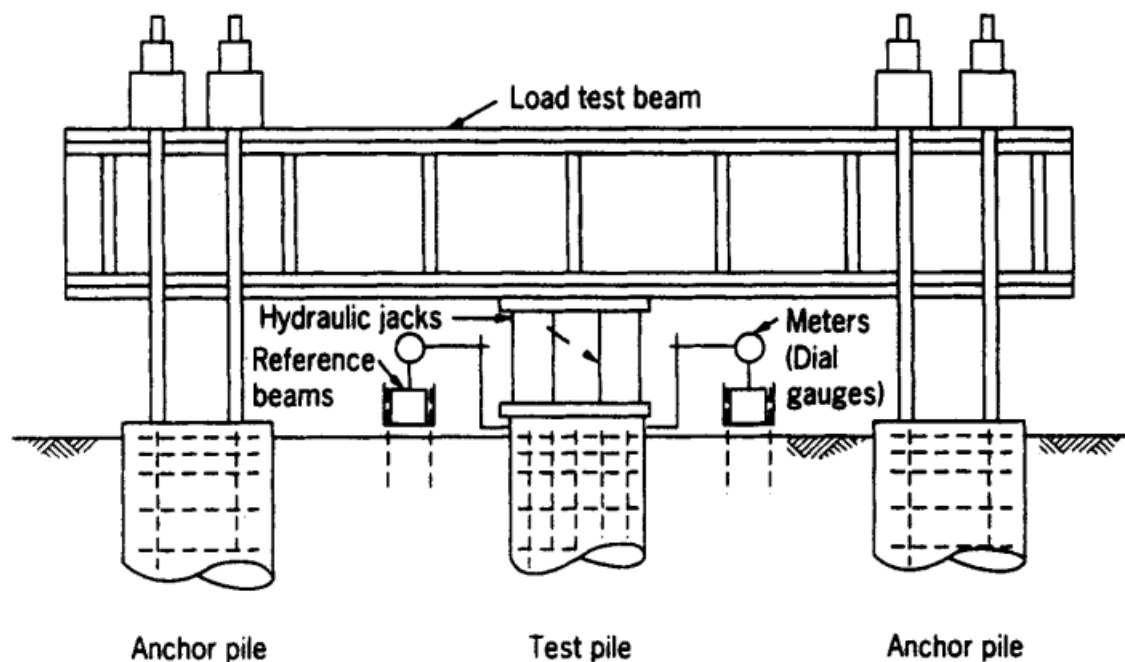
Typical setup for pile load test in compression. (Sharma et al., 1984).
